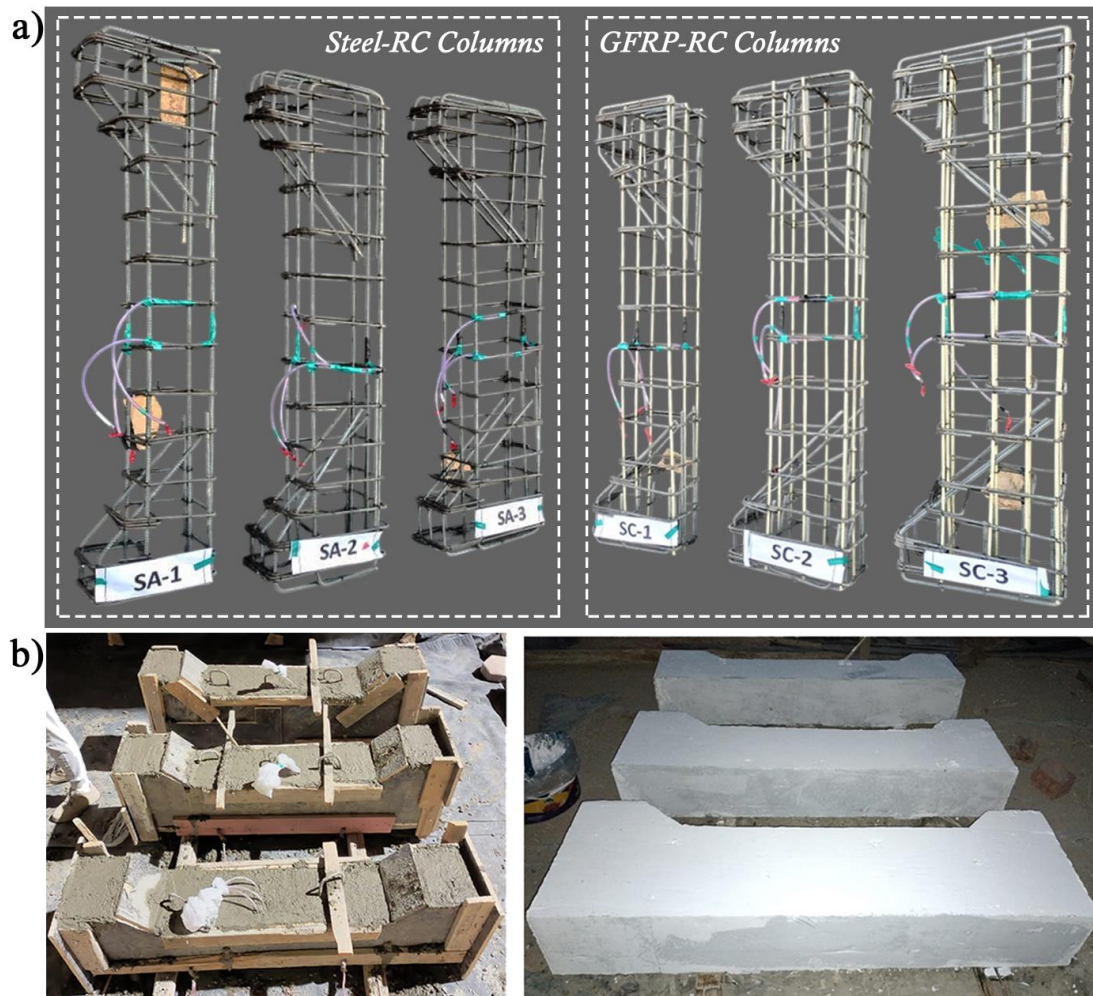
Fabrication and preparation of the column specimens: a) overview of the assembled reinforcement cages, and b) wooden formwork and casted column specimens
